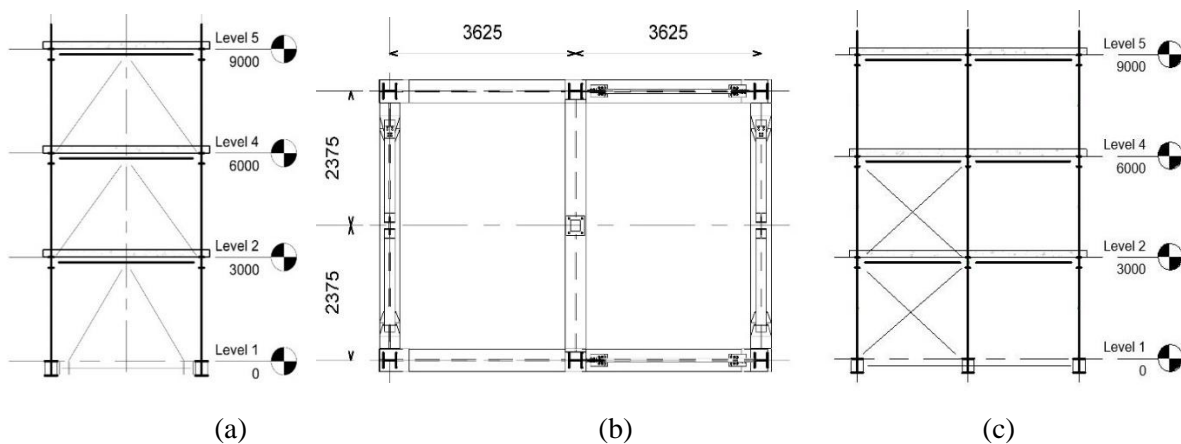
(a) transverse, (b) plan, and (c) longitudinal views of the test structure (mm).
